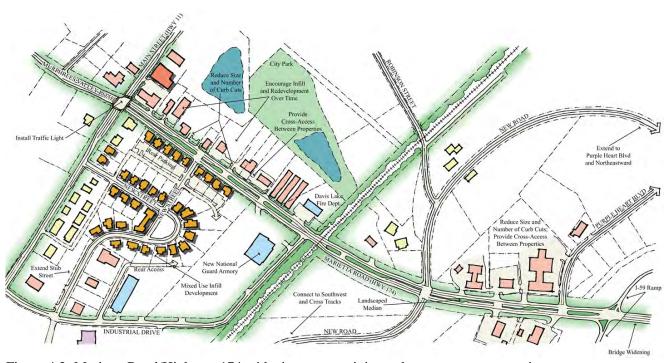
Marietta Road/Highway 174 widening, connectivity and access management improvements
